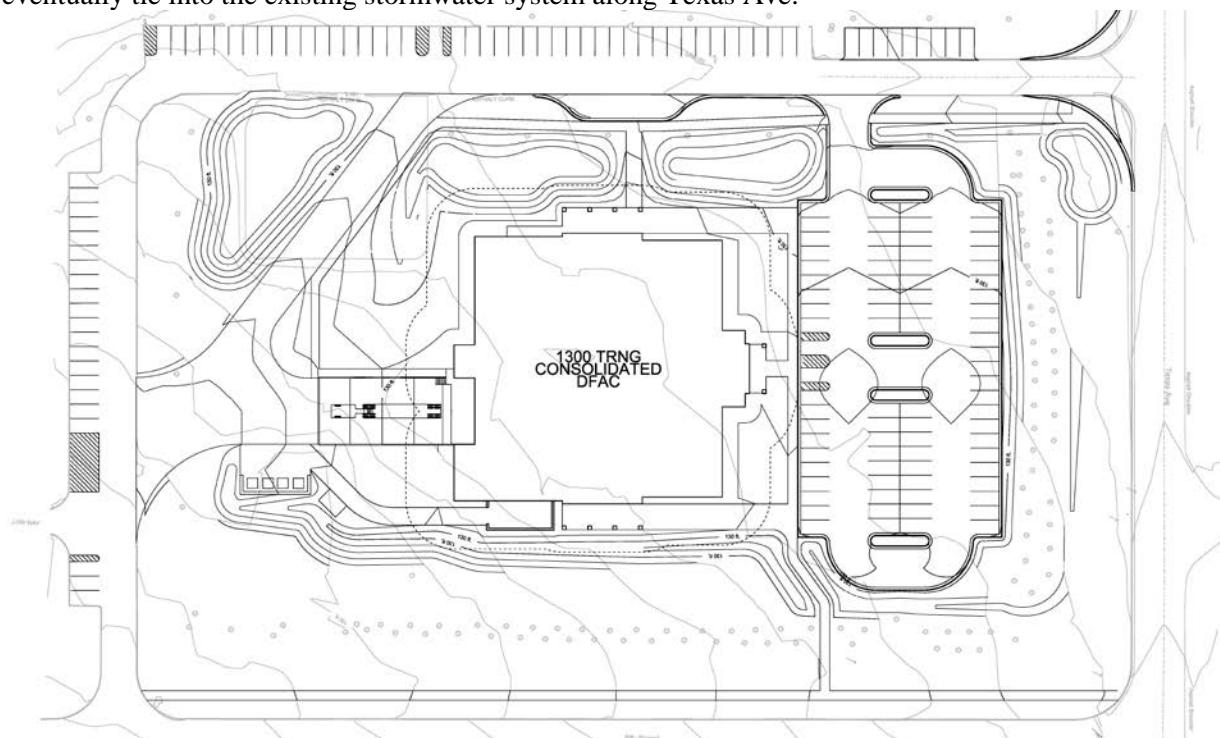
Proposed Dining Facility Preliminary Grading Plan
